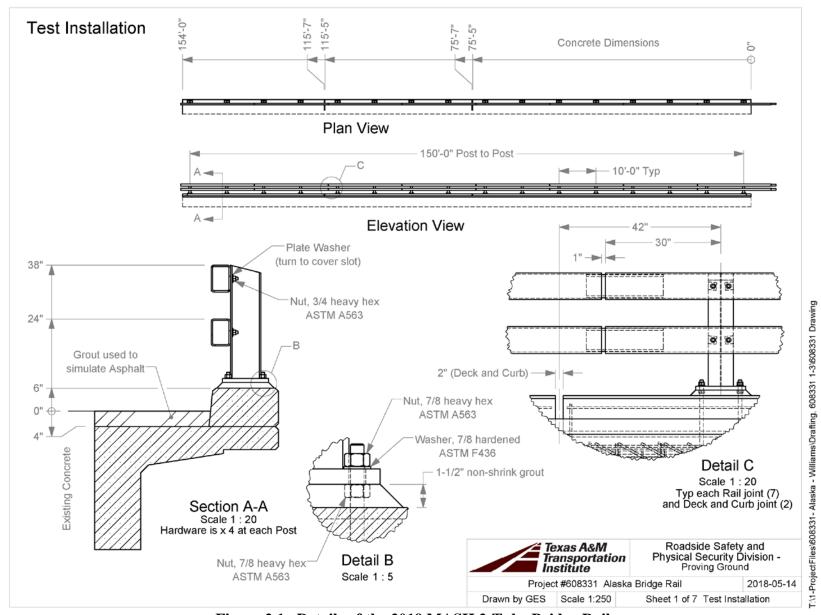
Details of the 2019 MASH 2-Tube Bridge Rail.
